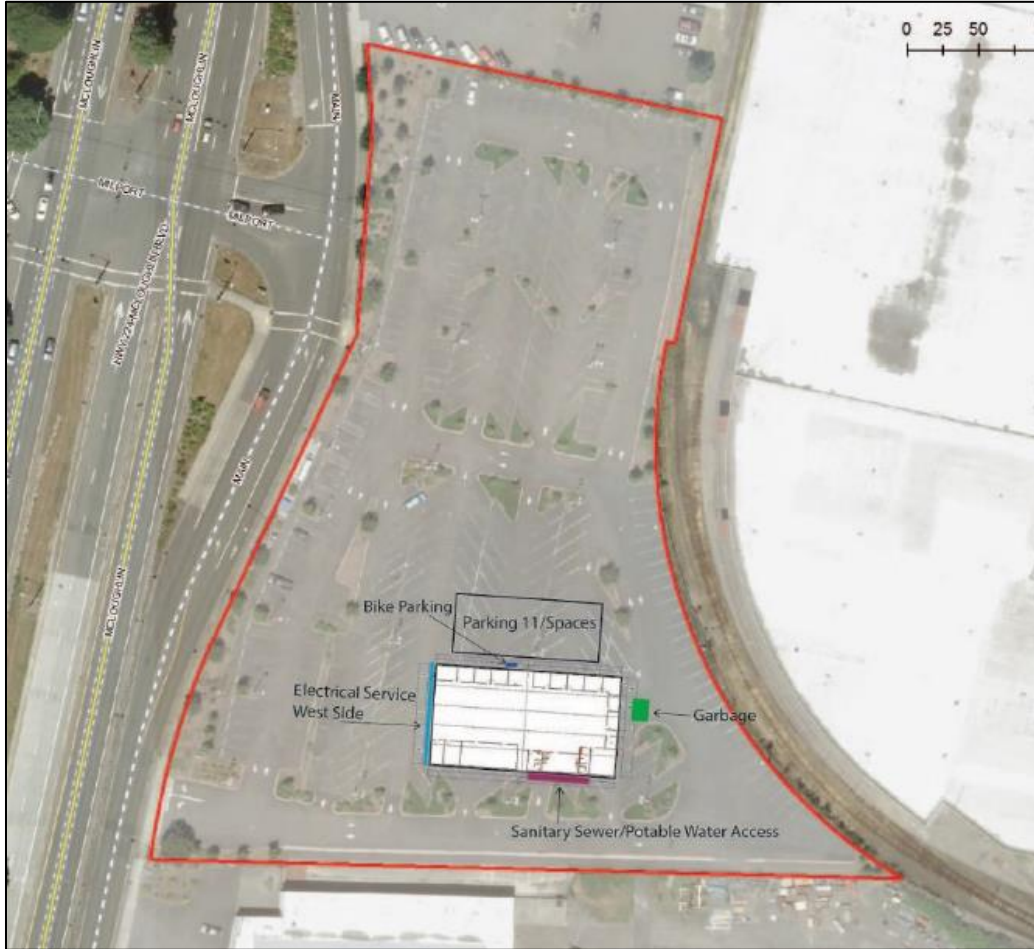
Proposed site plan showing location of modular building and general location of parking spaces.
